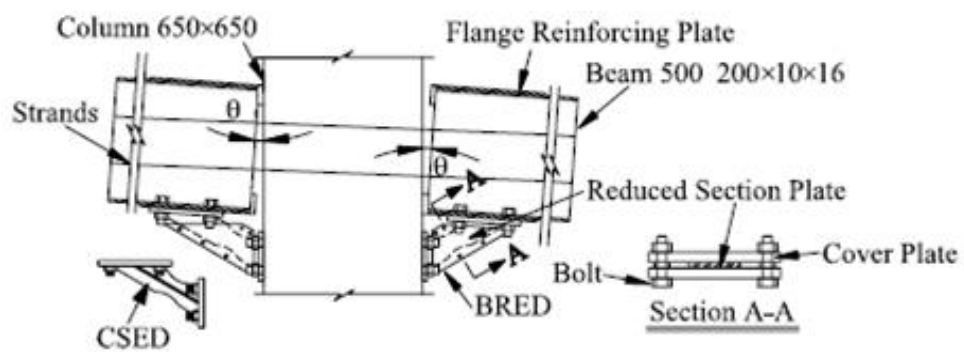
The proposed PT connection details (Chou and Lai 2009)
